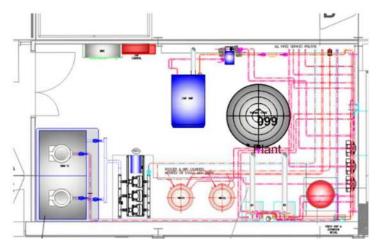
Proposed UoP Marine Station HIU (red) installation in main plant room
